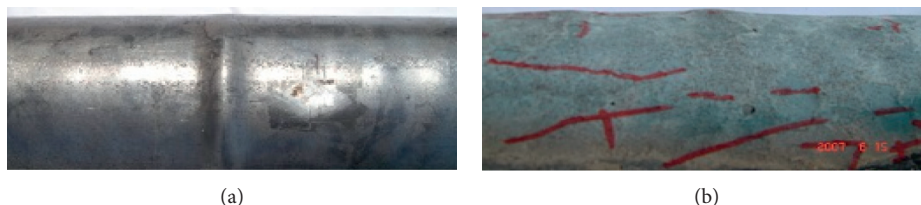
Internal and external damage of specimen failure. (a) Steel tube. (b) Concrete.
